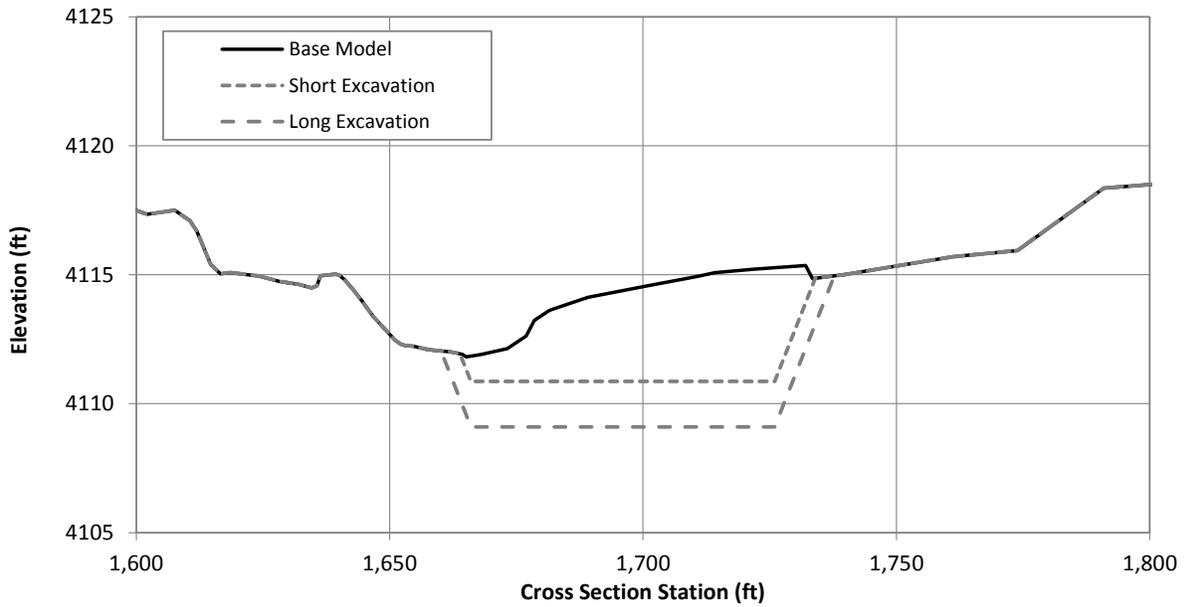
Typical cross section at Problem Location 1 showing the existing (Base Model) channel geometry and excavated geometry under the short and long excavation scenarios (River Station 527320.4).
